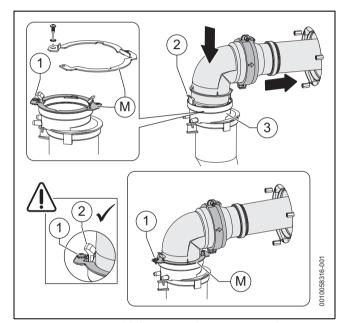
Adaptor assembly fitting to appliance exhaust outlet
